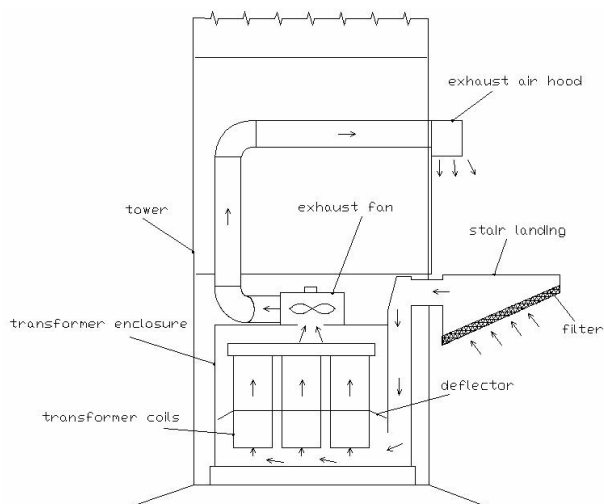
1: Exemplary arrangement ventilation system
